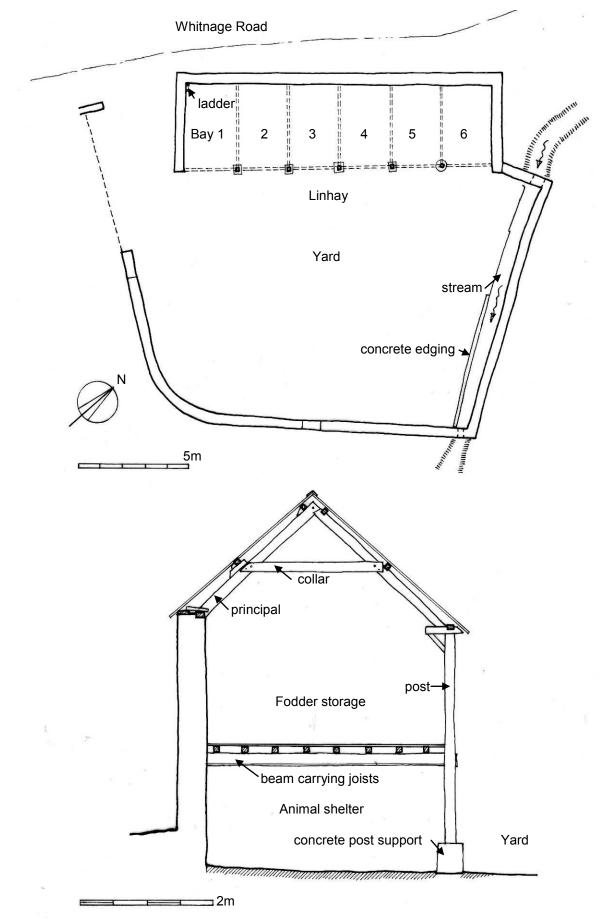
Hill Kiln Linhay: ground plan and typical section (n-w – s-e)
